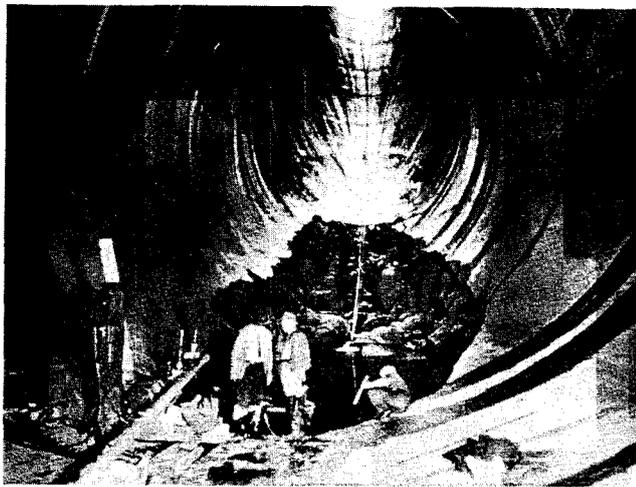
1941 cavitation damage in the Arizona spillway tunnel at Hoover Dam.
